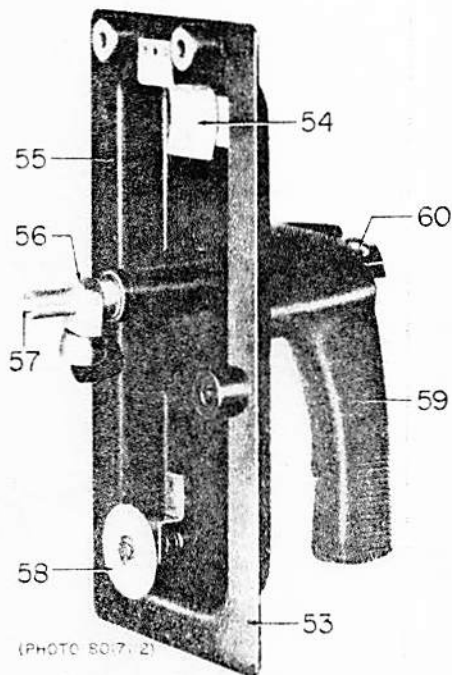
Manual operating handle and escutcheon used on breakers up to and including -6 (ref. 52)
